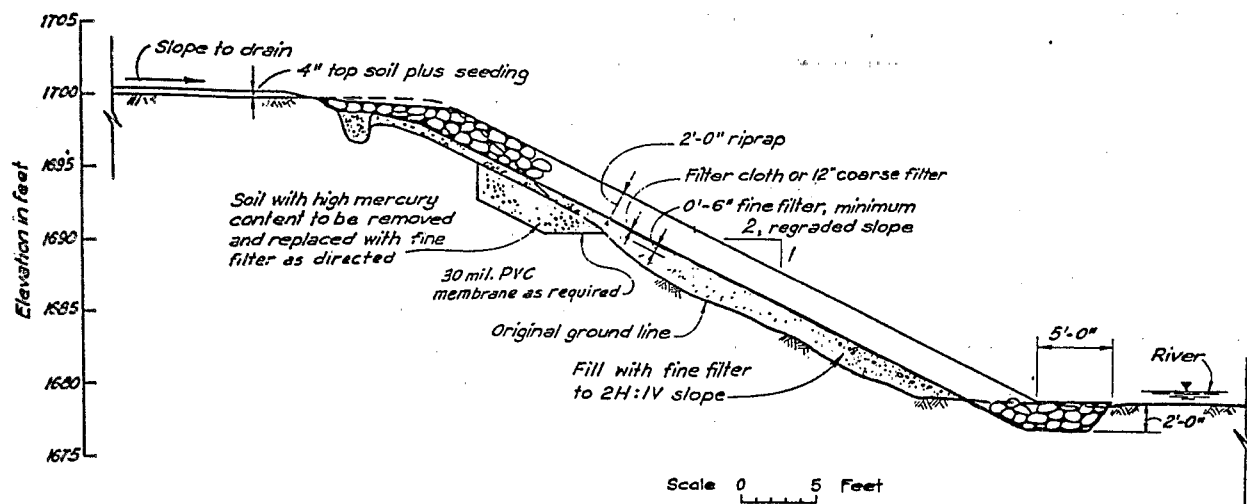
Construction details for sealing North Fork riverbank. [2-6]
